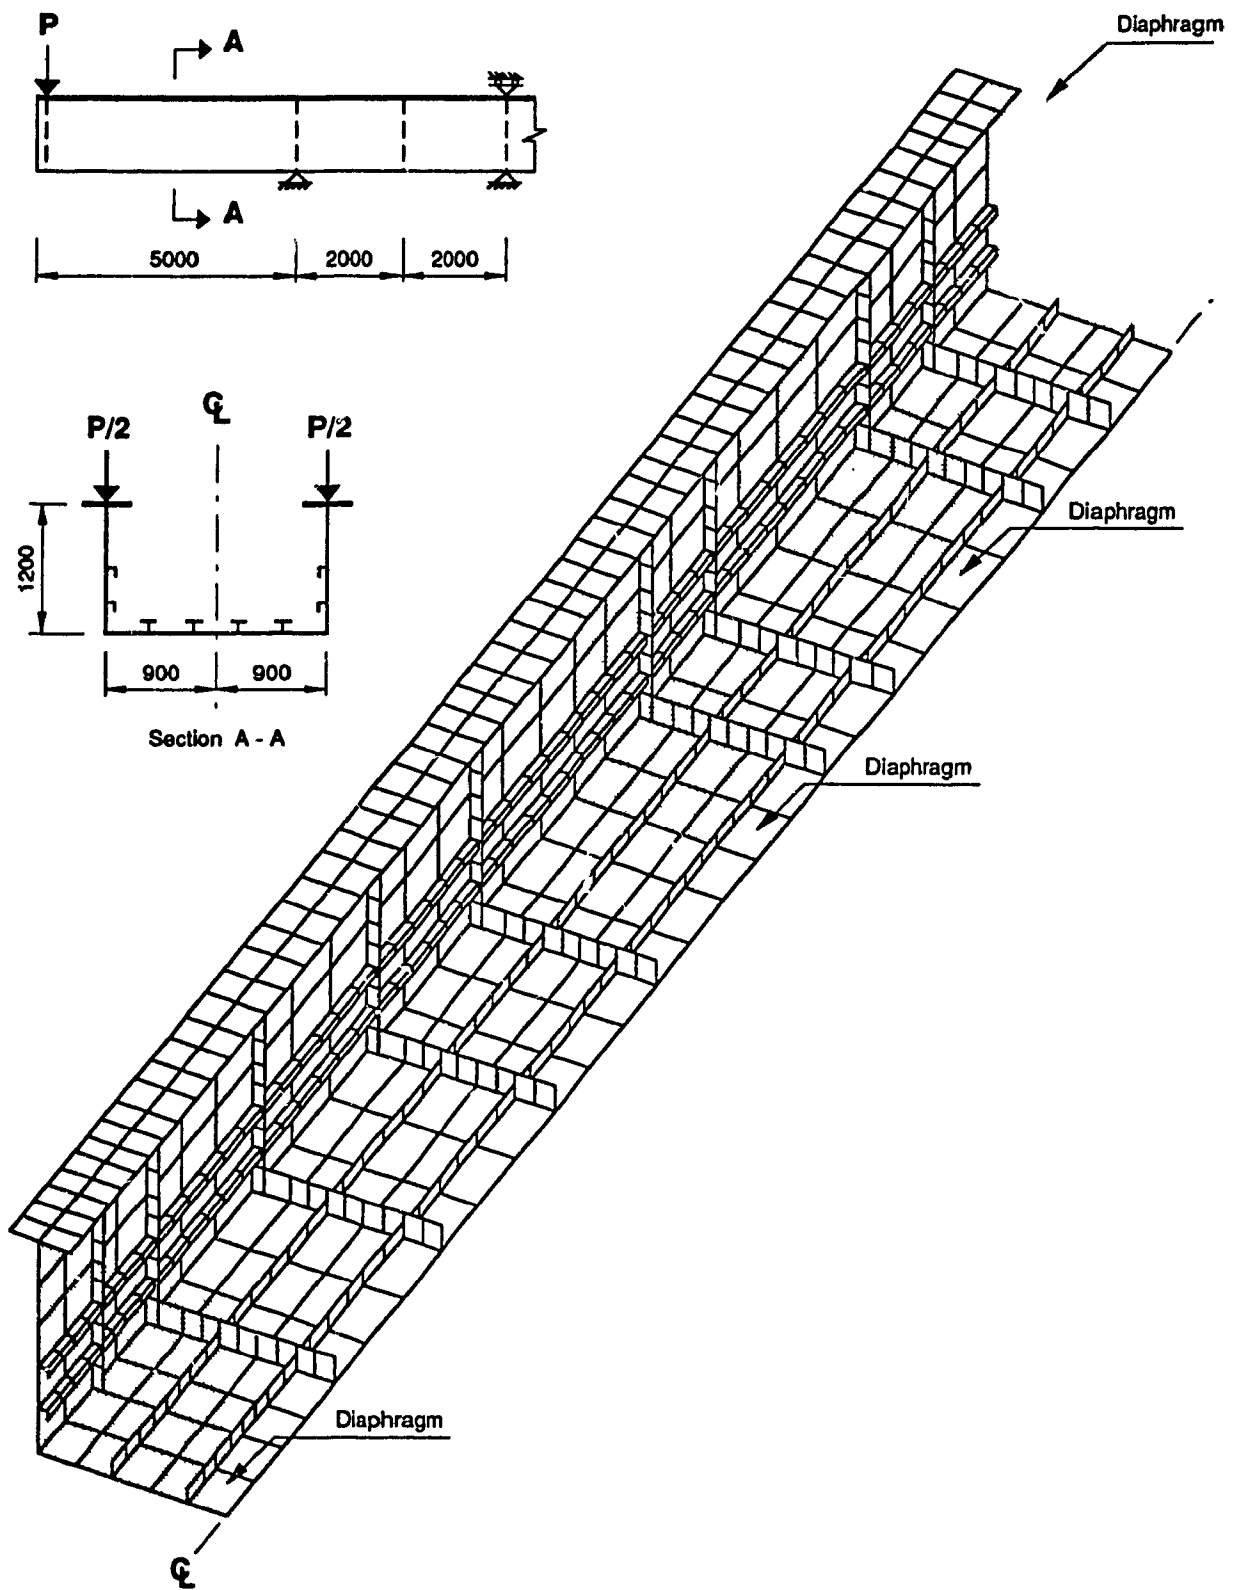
c Steel Box Girder Model. Finite Element Discretization
